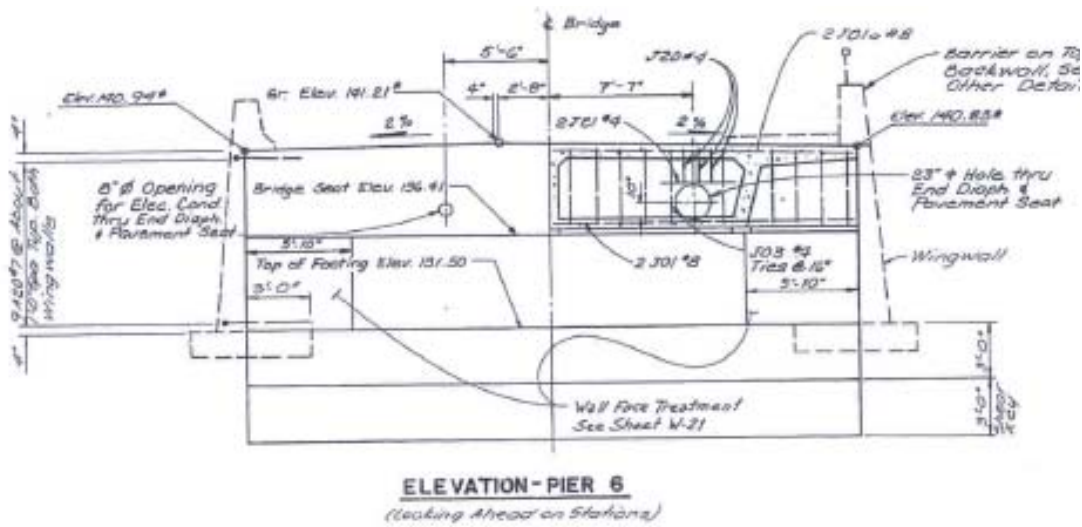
Bridge 90 Abutment and Deck Elevation View
